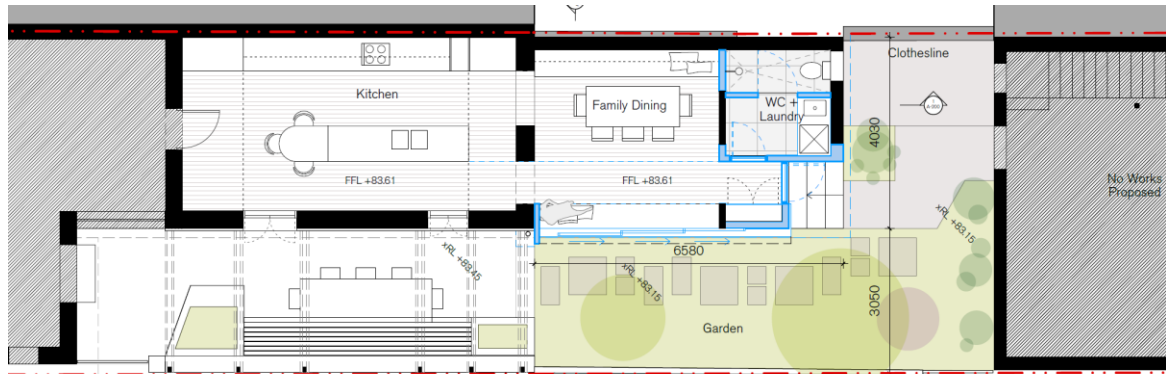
Proposed ground floor plan - 2 Bishops Avenue, Randwick (Source: McGregor Westlake Architecture)
